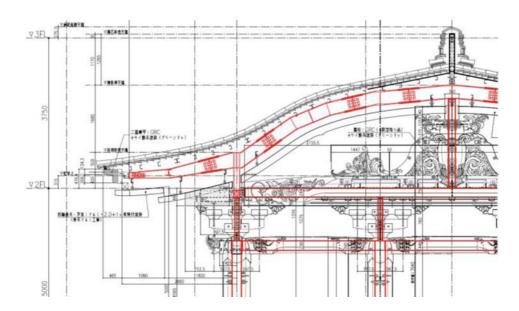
Details of Karahafu-style gable and concealing the structural steelwork.
